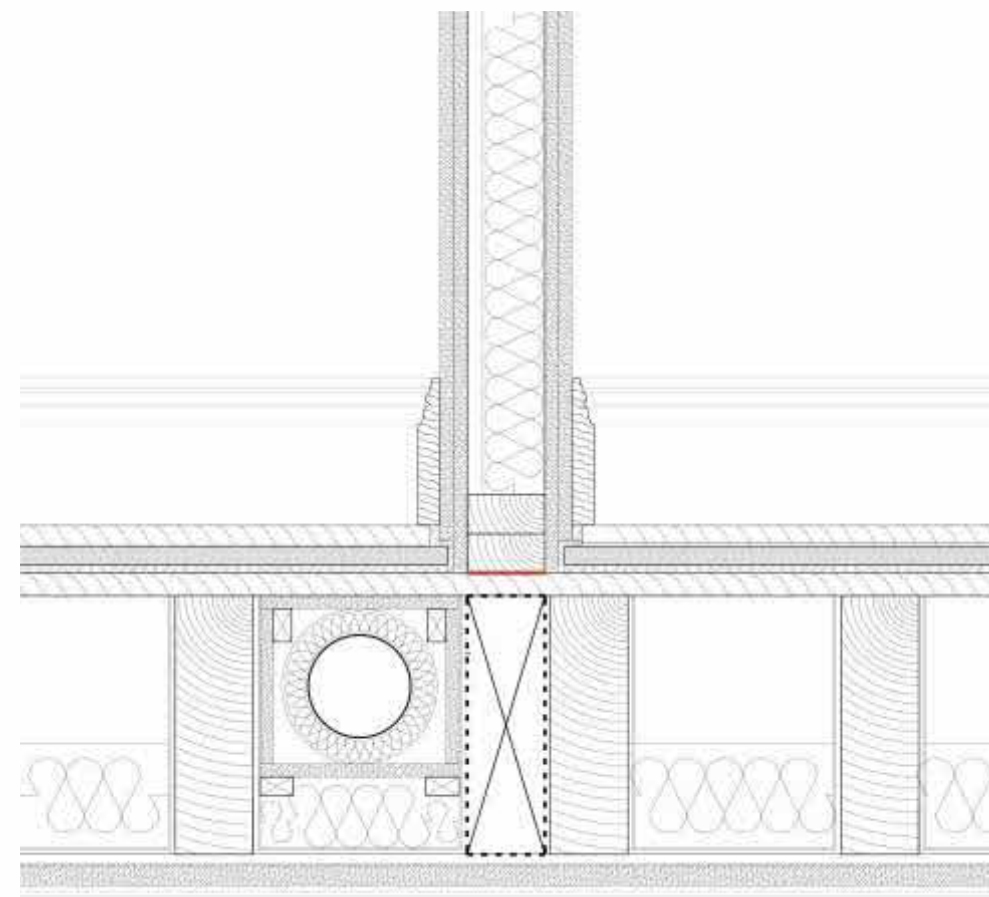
Proposed acoustic floor and wall interventions with existing internal fabric
